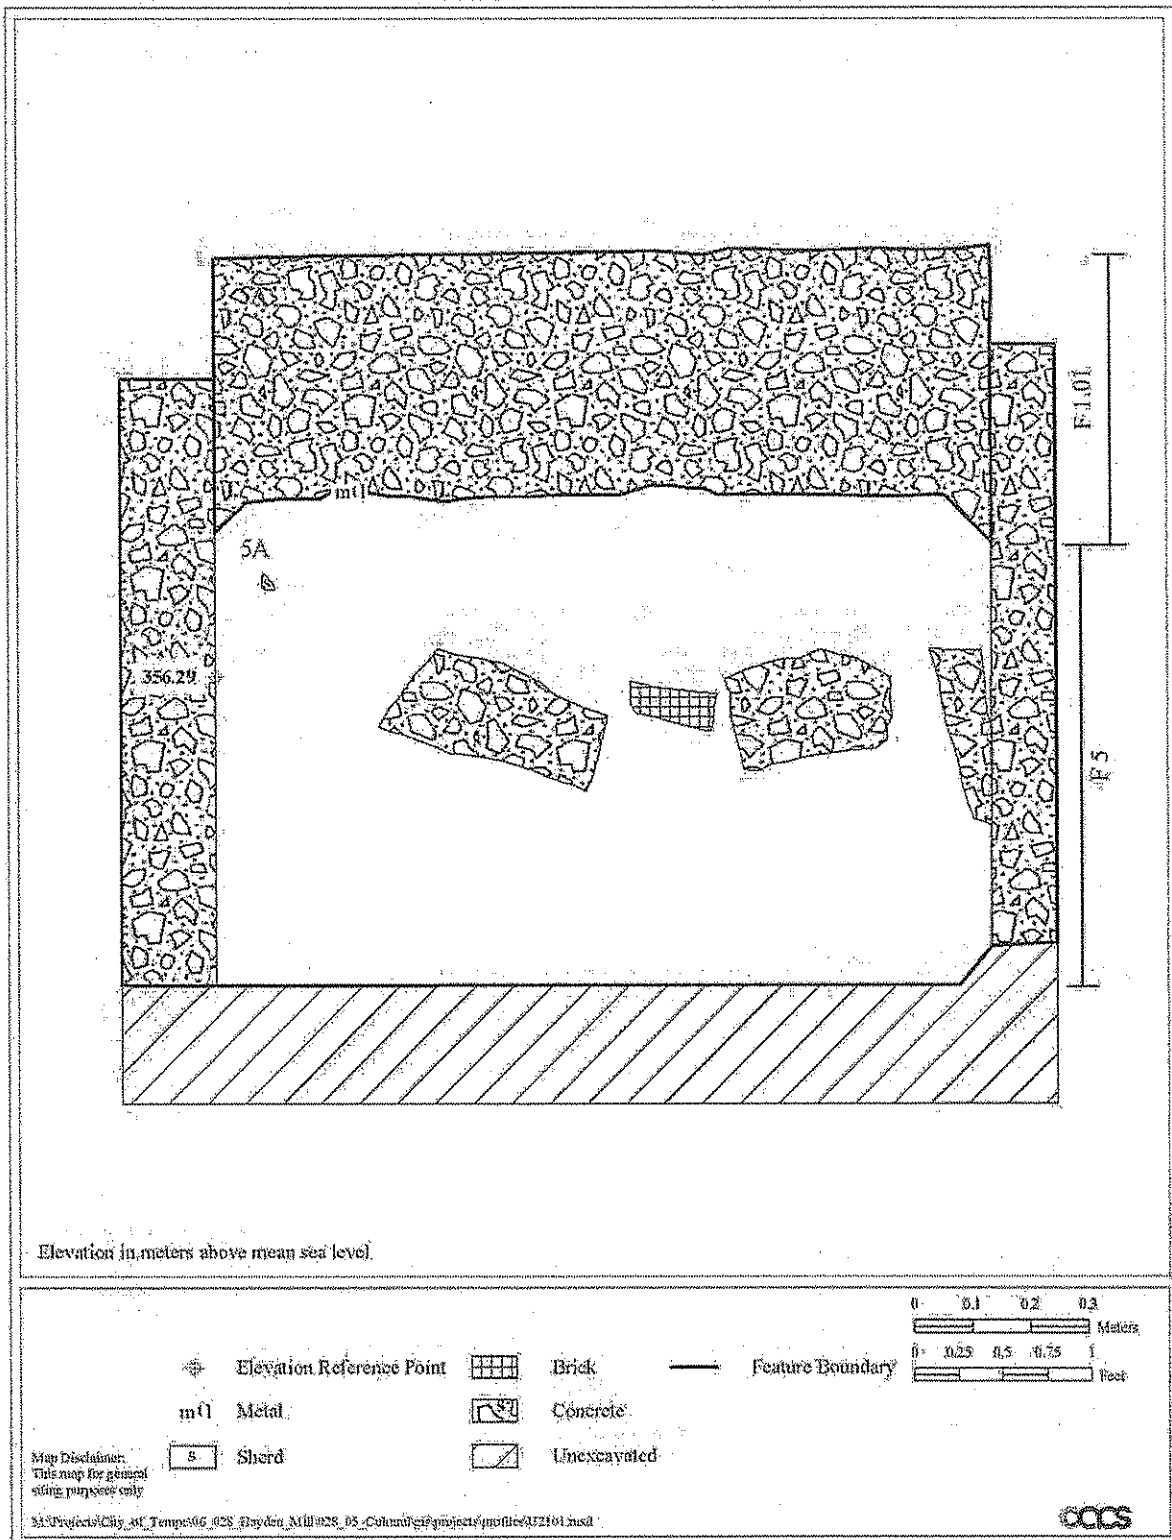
South wall profile (U2101) in hand-excavation unit U2085 of concrete-lined diversion ditch Feature 5 at the headwall (Subfeature 1.01) of the concrete culvert (Feature 1), Hayden Ditch site (AZ U:9:189[ASM]), facing south.
